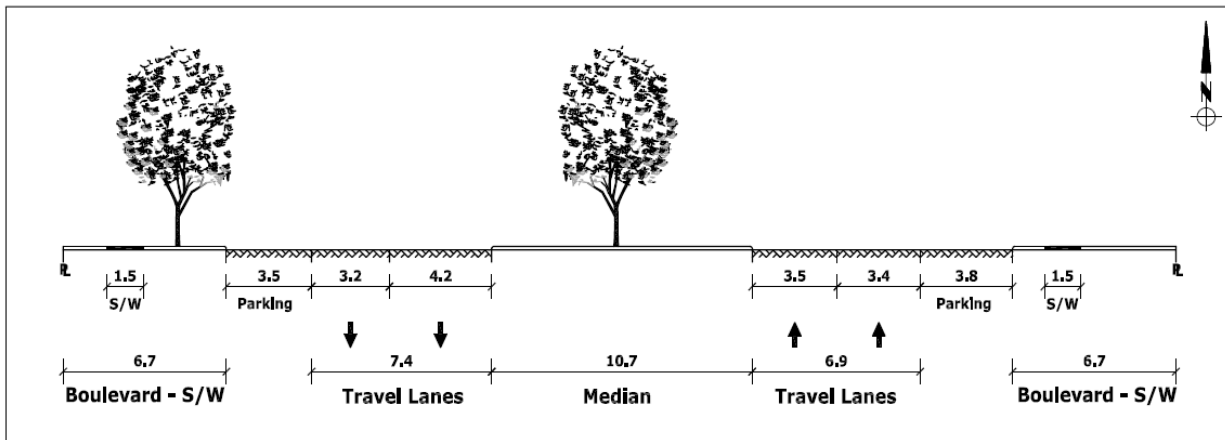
SW Marine to 49<sup>th</sup> Avenue - Typical Pre-construction Configuration
